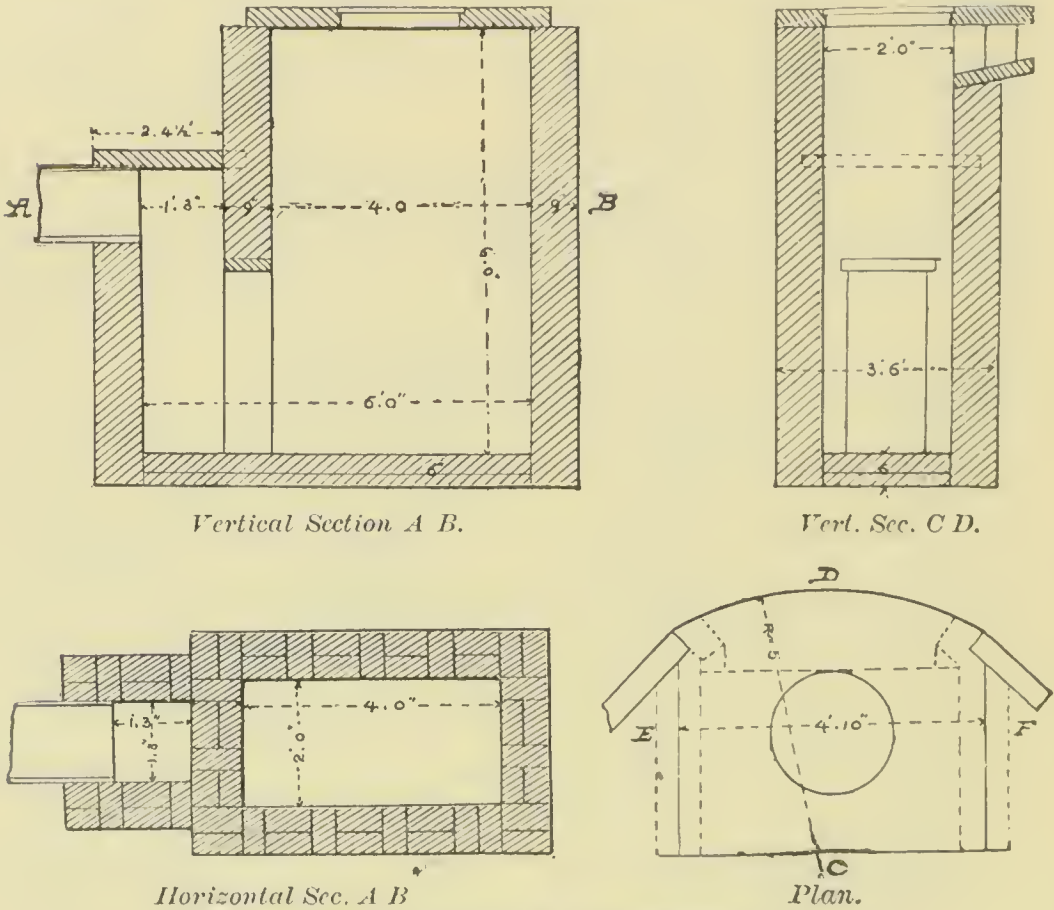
CATCH BASIN, WASHINGTON, D. C.
